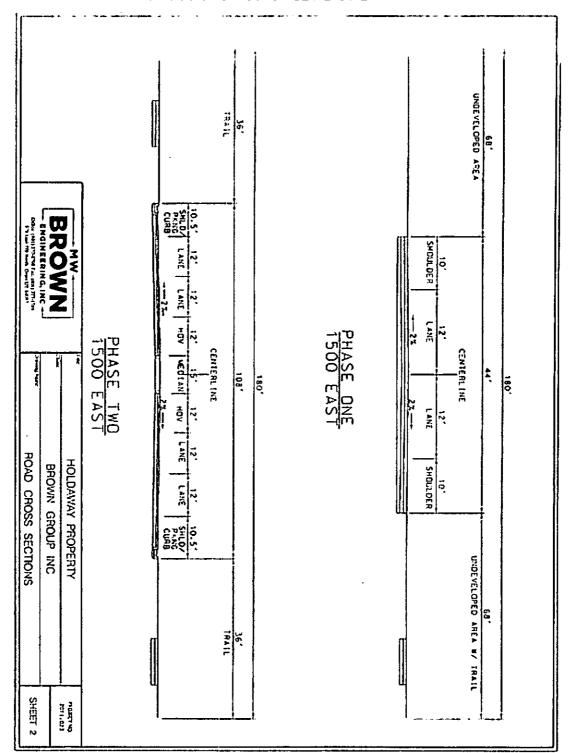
EXHIBIT D: ROAD CROSS SECTION SHEET 2 OF 2
